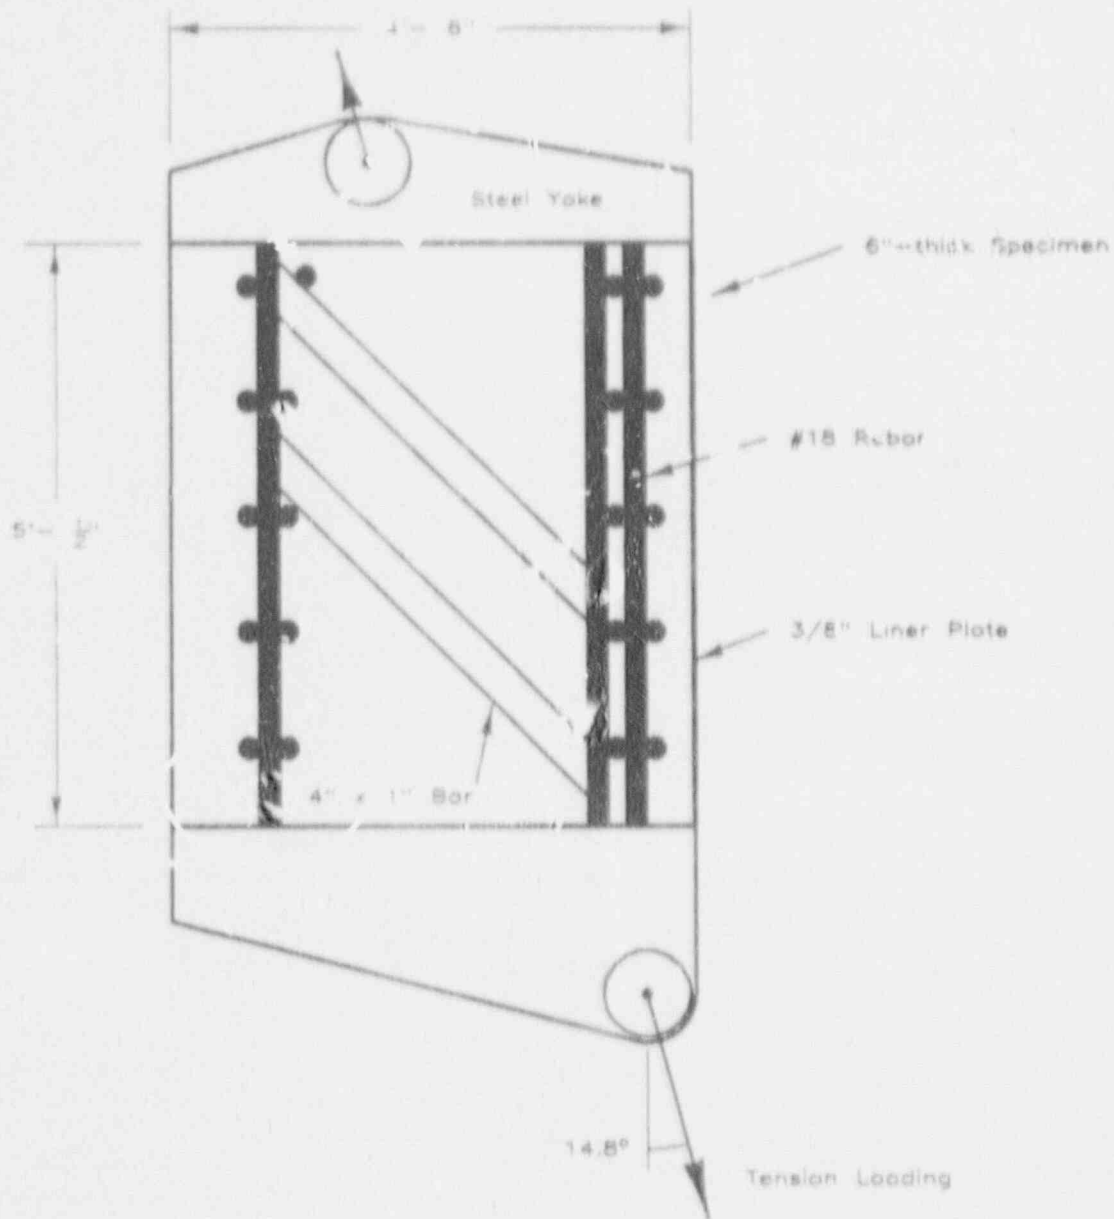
Full-size Model of a Containment Wall Segment Tested by Stone and Webster Engineering Co.
